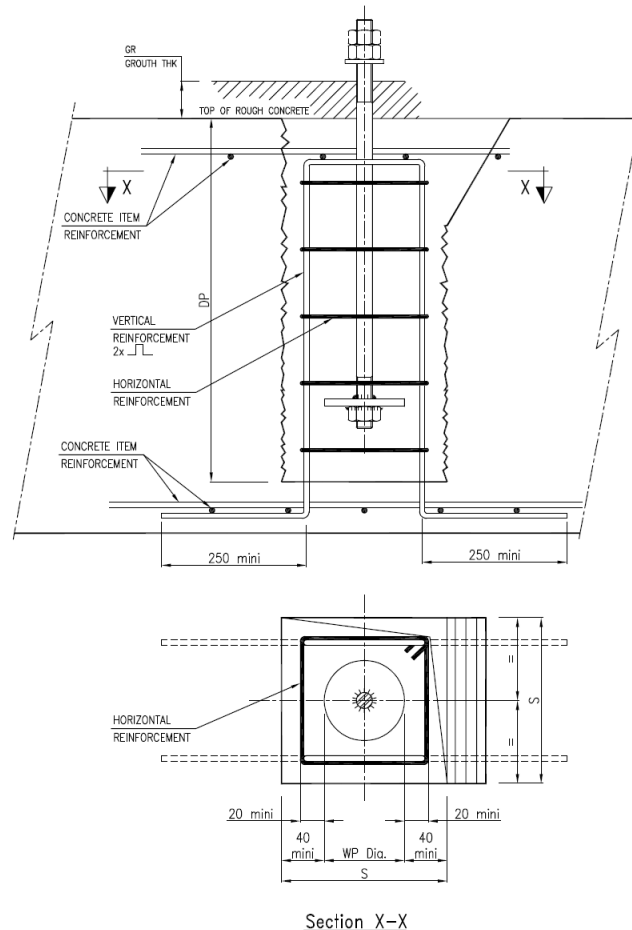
Typical reinforcement for cast-in headed bolt.
